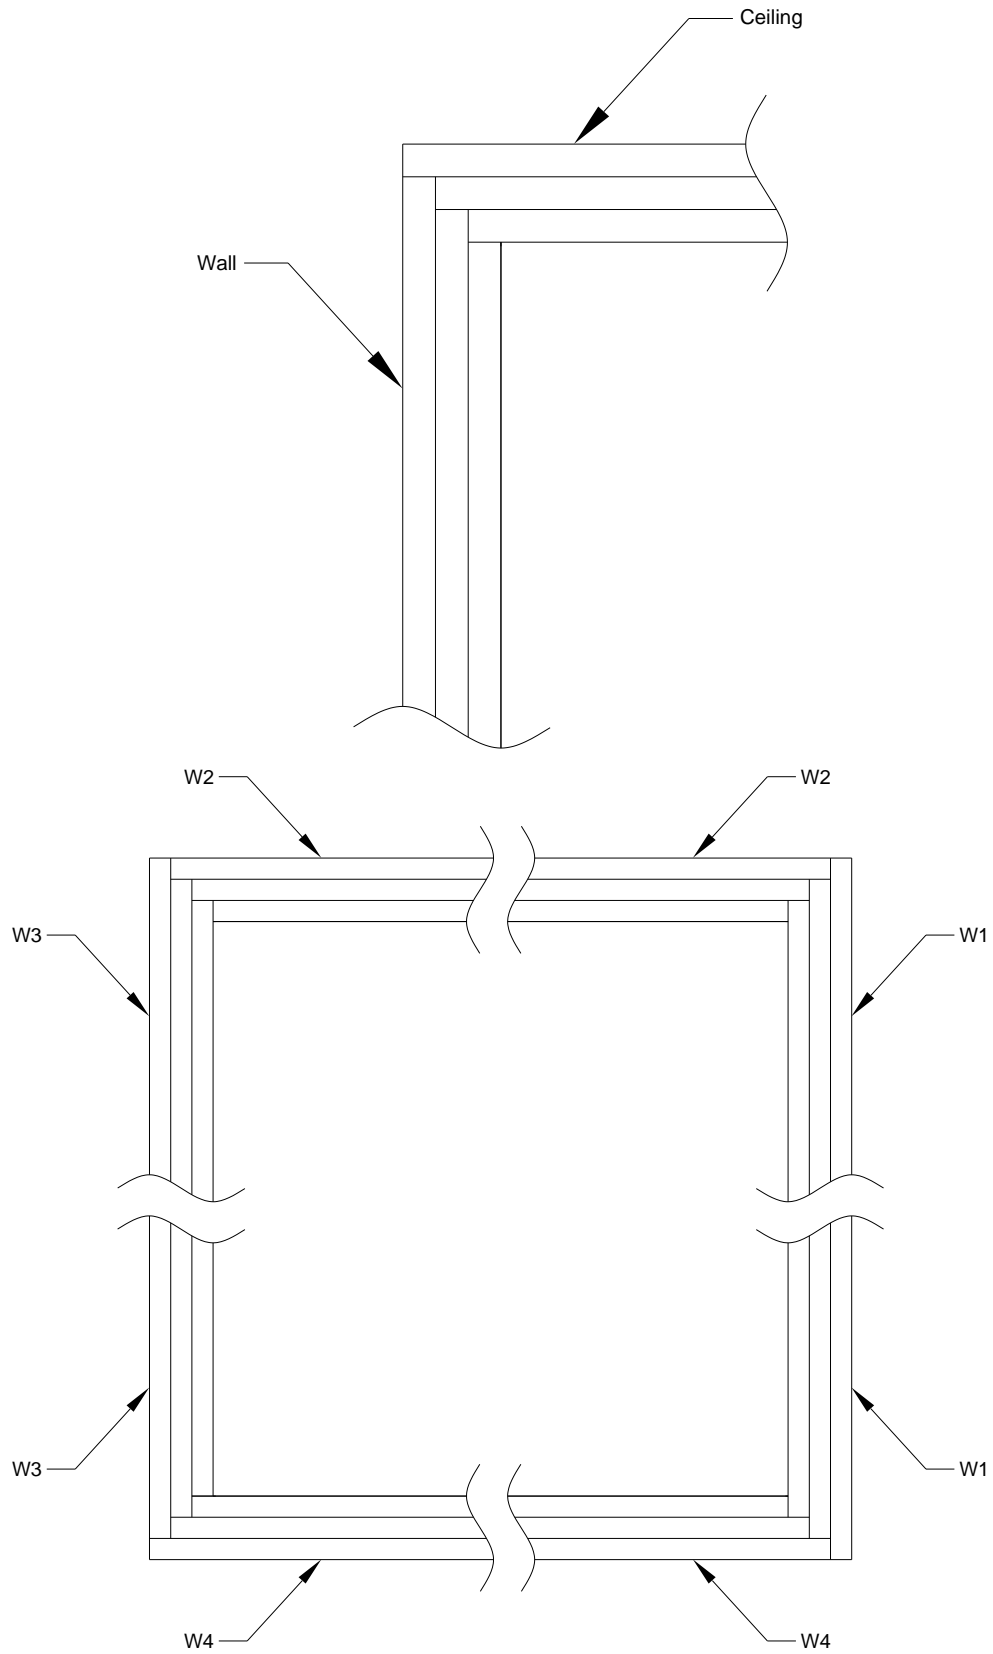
Stair-step installation for multilayer gypsum board (cross section view).
